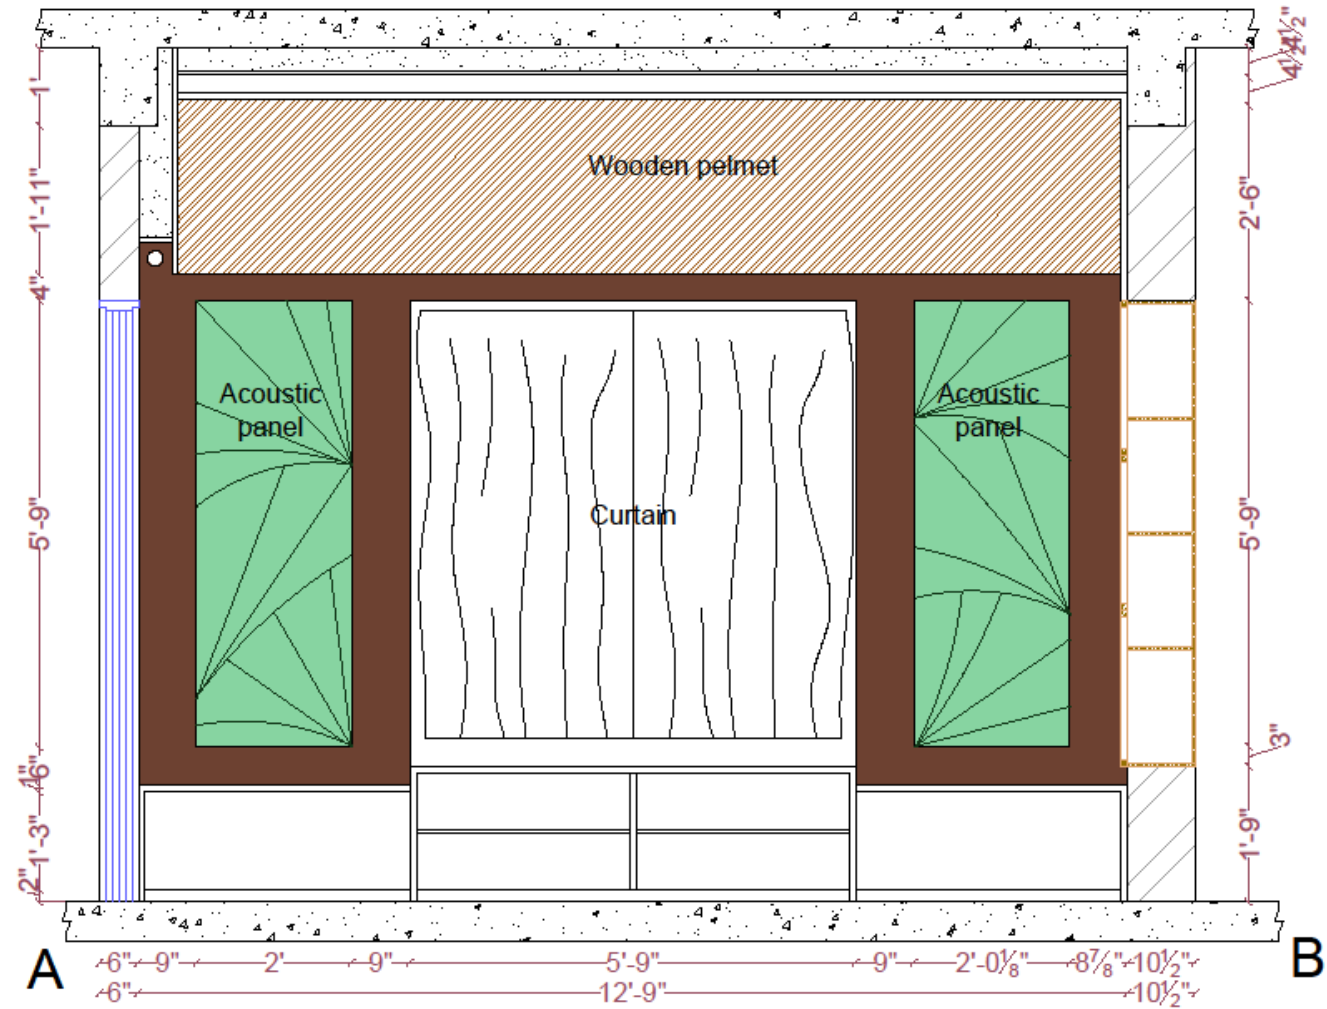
PROPOSED WALL ELEVATION AB (option -2)
